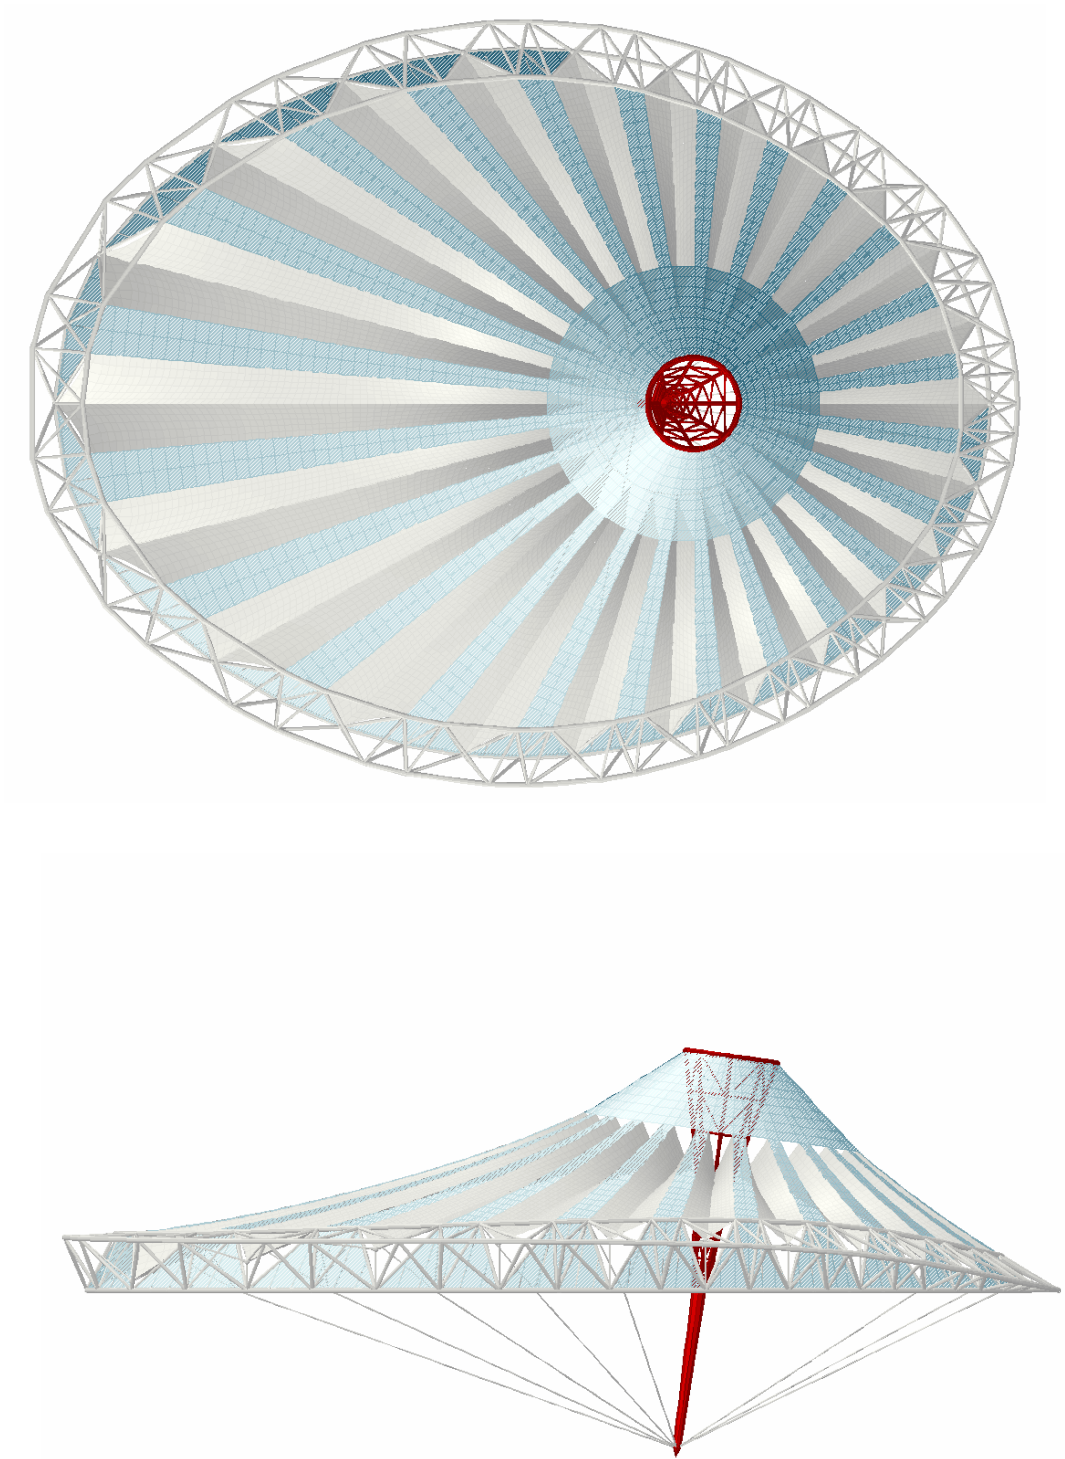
Sony Center, Forum Roof: Plan view and elevation (Main span 102m, 5250m<sup>2</sup> PTFE, 3250m<sup>2</sup> of laminated glass (2x8mm), height of king post 42.50m)
